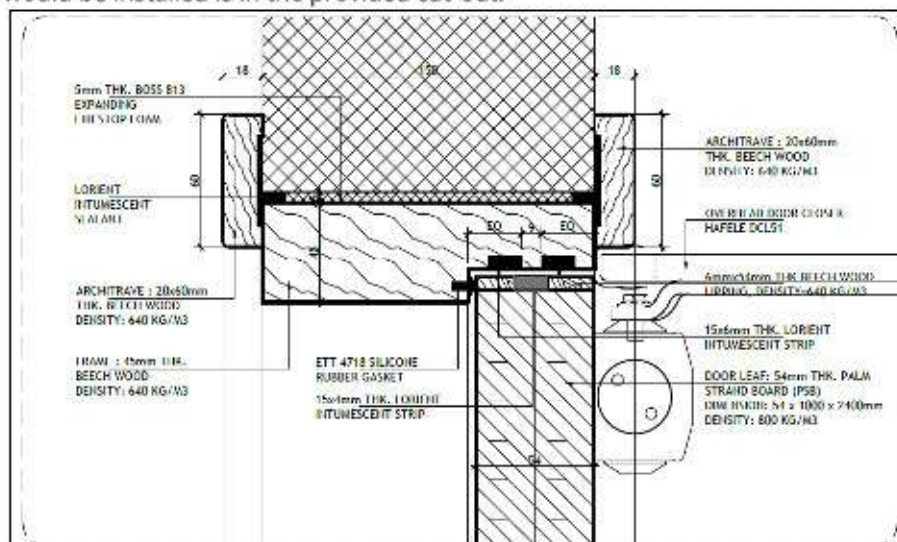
Cross-section of Door 1 having hard wood as frame and architrave.
